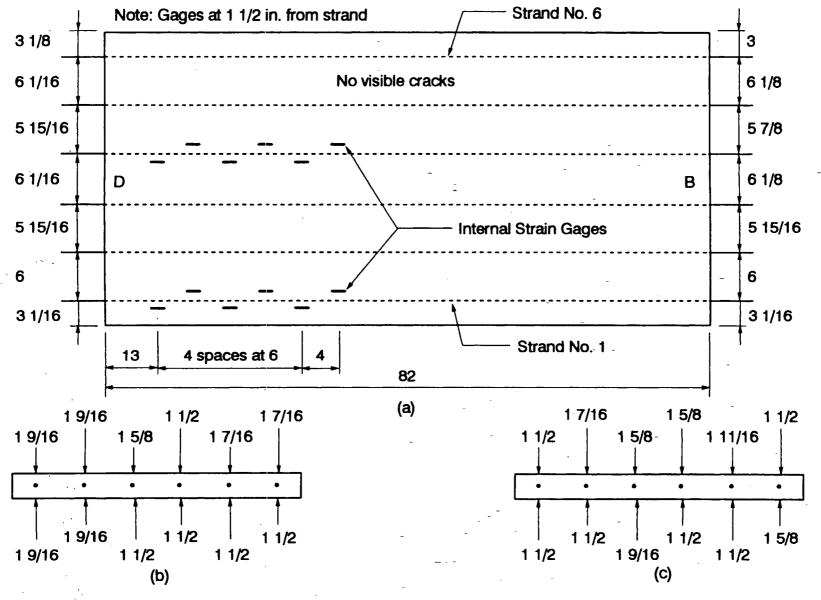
Specimen No. 16-3.0TU-2 (dimensions shown in inches):
